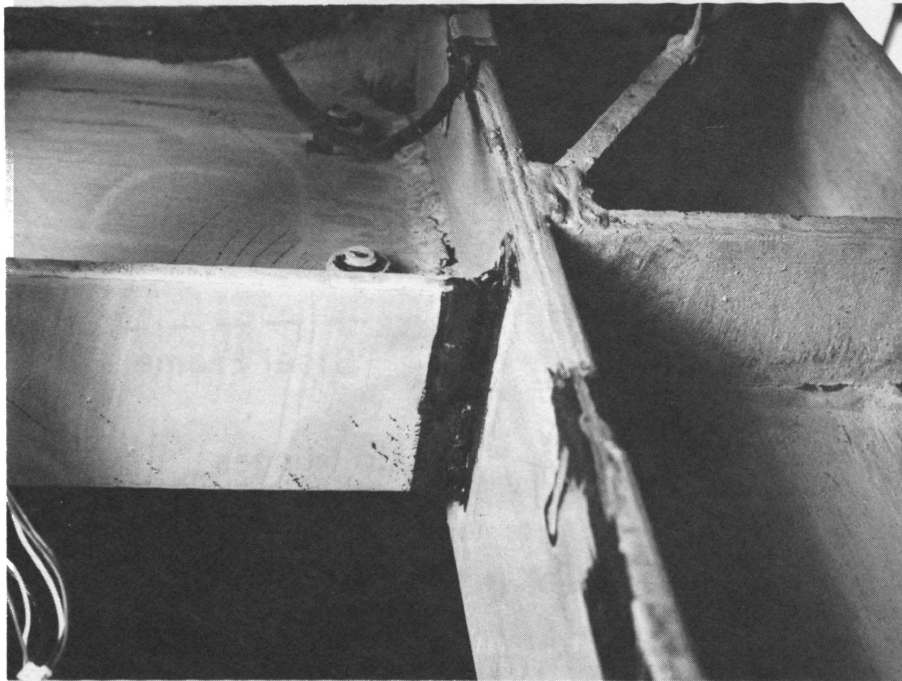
Weld Fracture at West Column of CA-2
